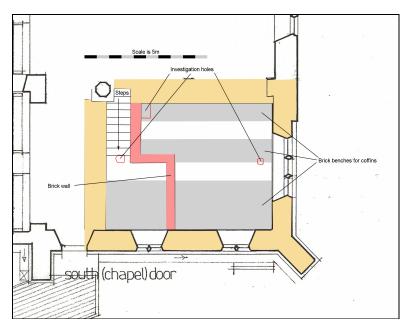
Plan of Slaugham Church indicating the position of the Covert vault.
